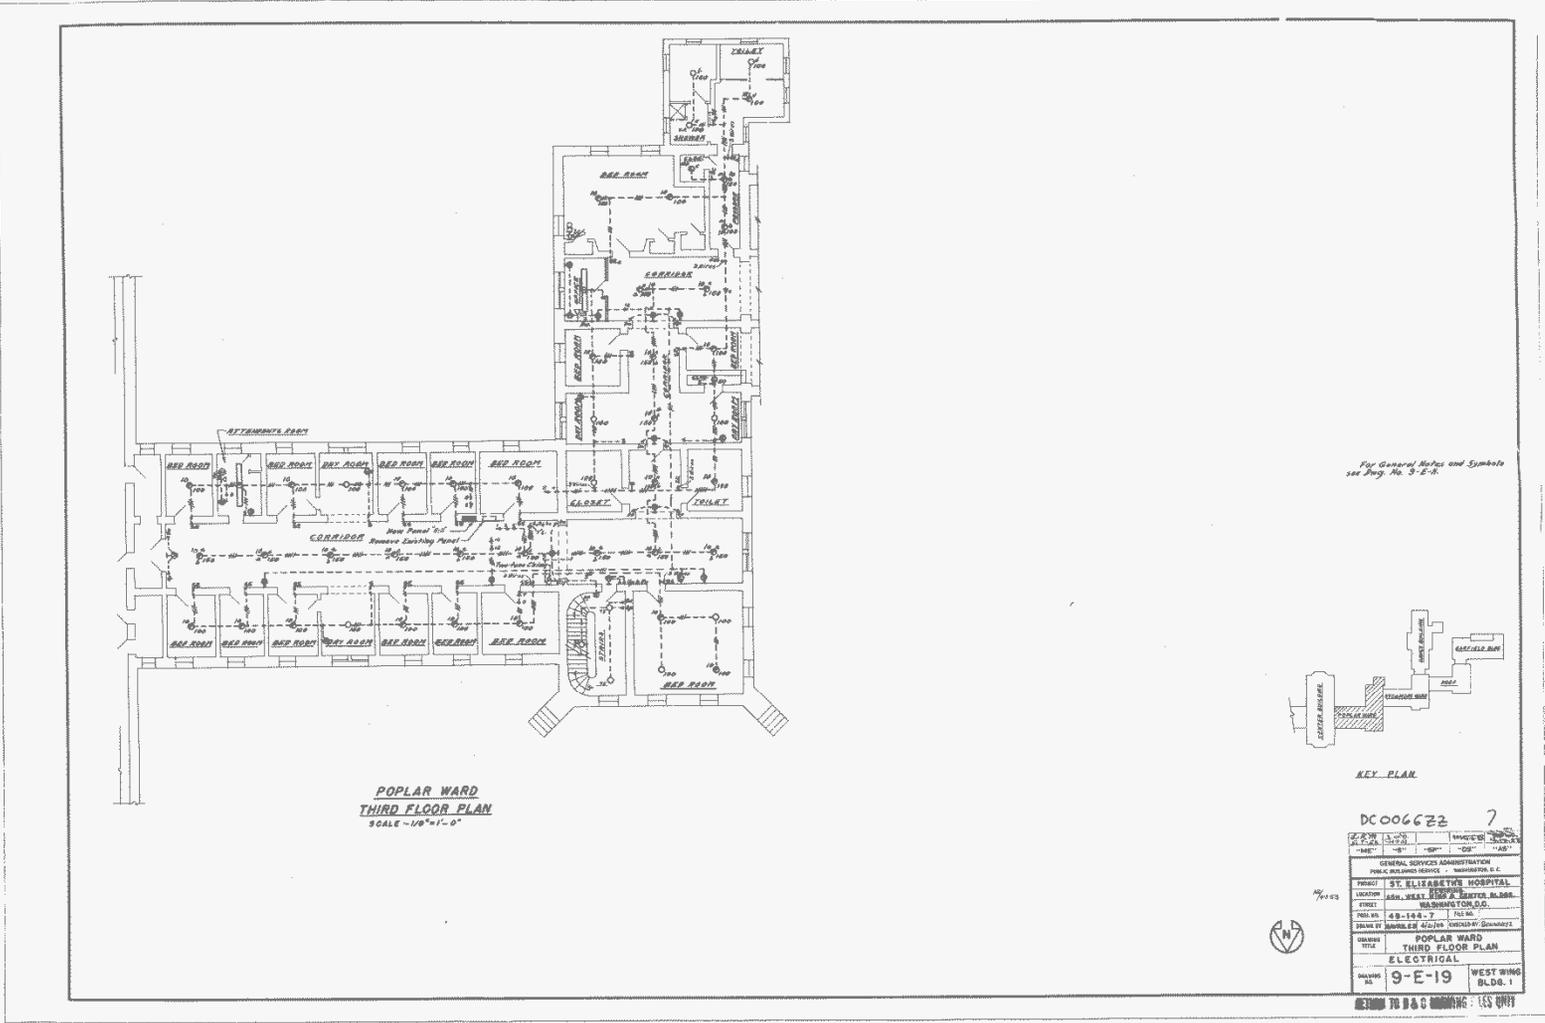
Third floor plan of the west wing of the Center Building, Poplar ward, outlining improvements to the electrical system, 1953. Source: GSA archives, image DC0066SE0007.
